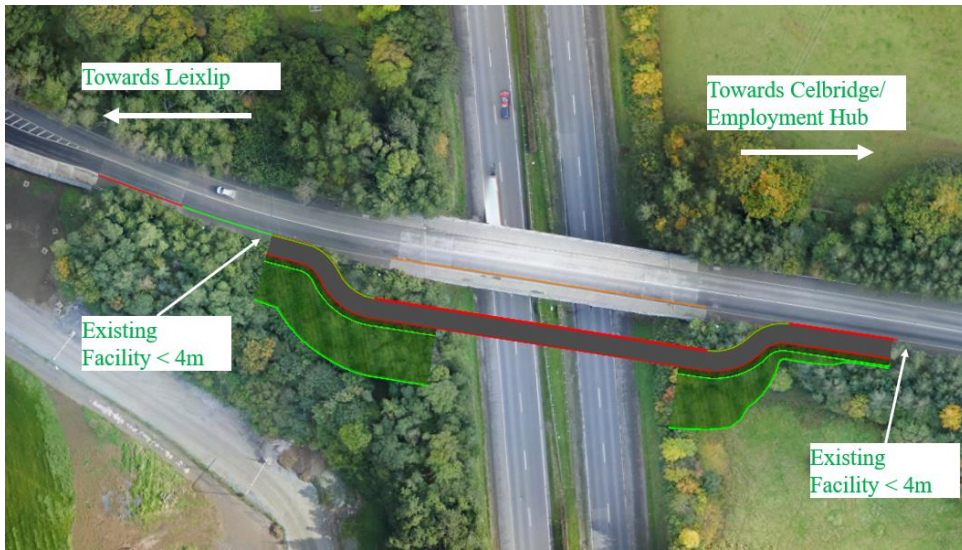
Option 1 - Active Travel Overbridge west of the R404 Celbridge Road Overbridge
